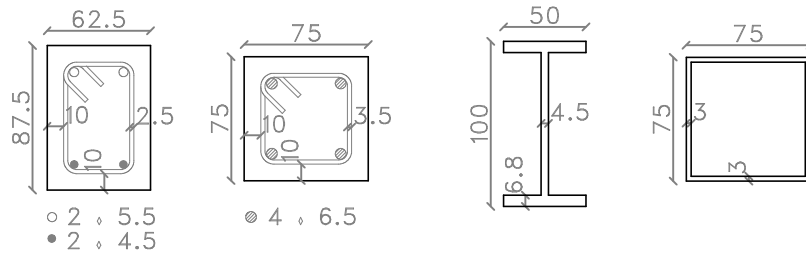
Concrete and steel beam and column sections of the specimens.
